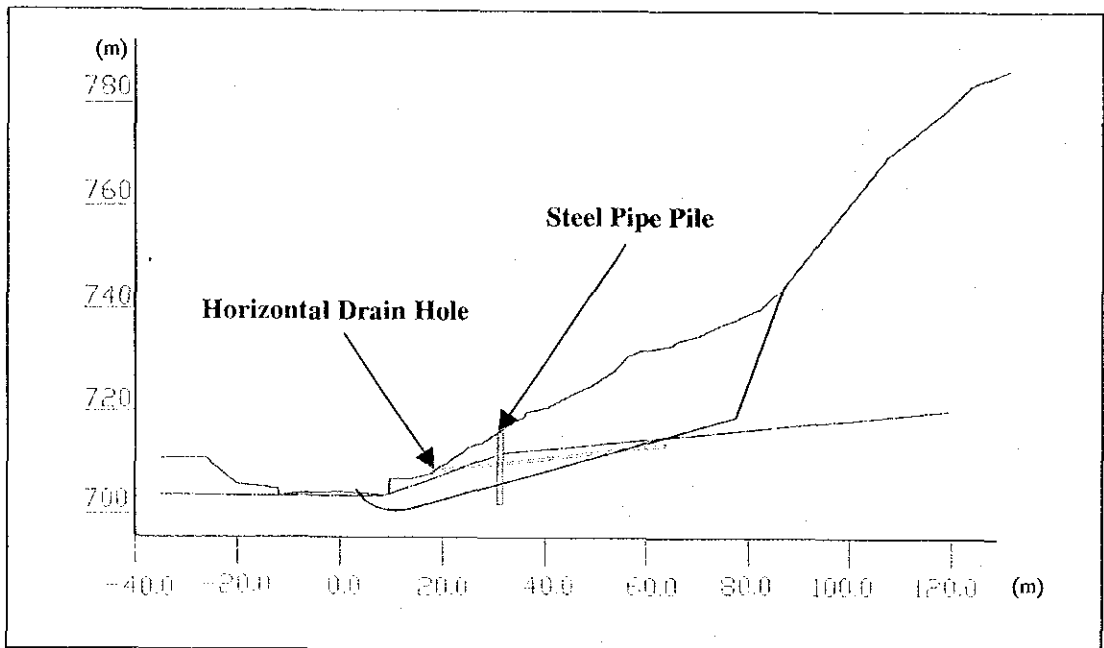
Cross section of Steel-pipe pile works in CH 81.30 km
